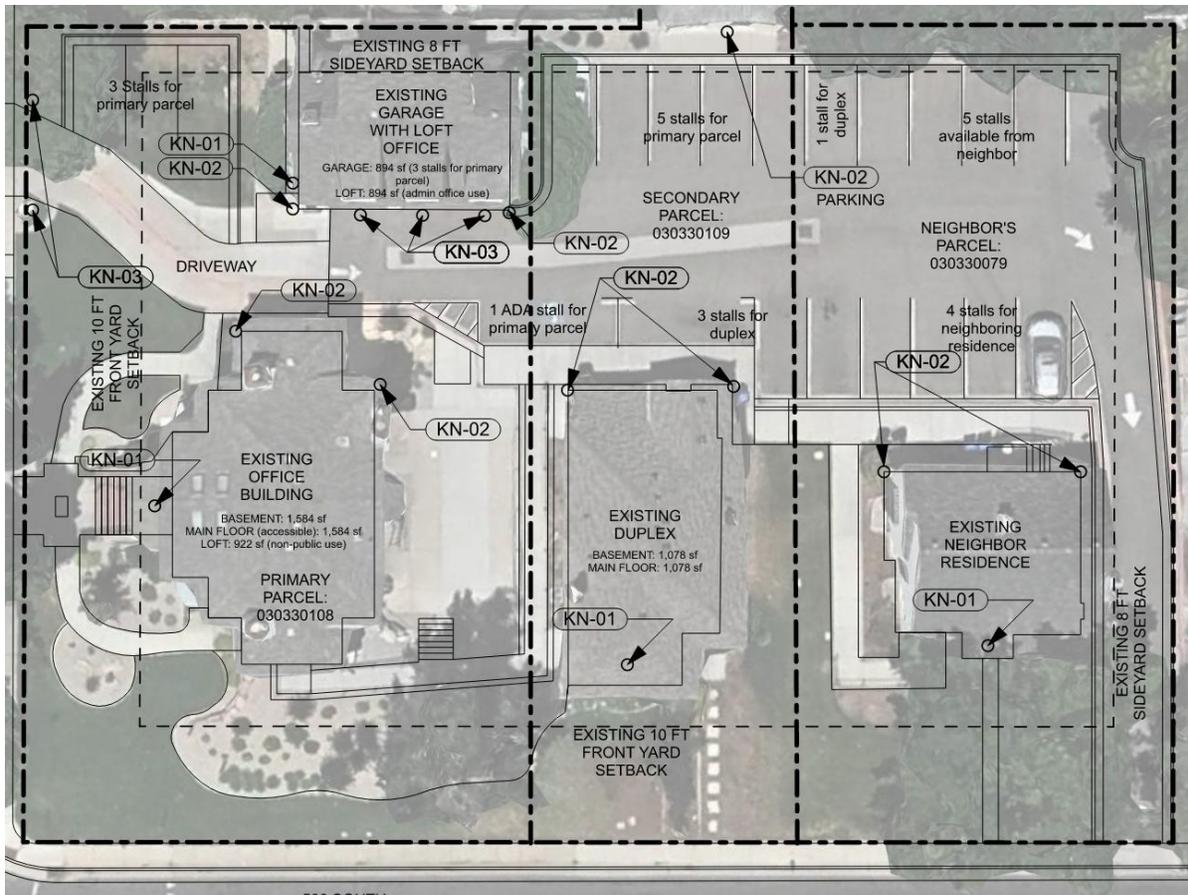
Applicant's Site Plan Submittal, 485 S 100 E
